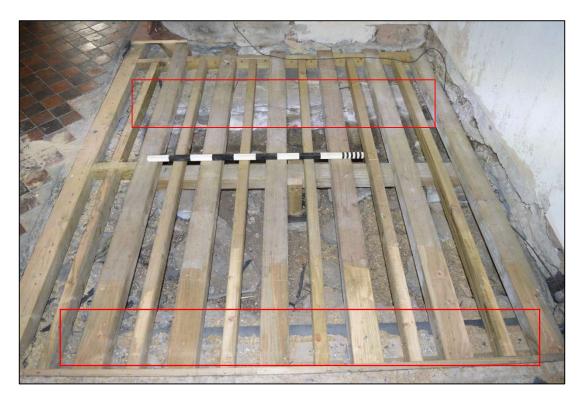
Sleeper walls (highlighted in red) aligned east/west in the south-west part of the nave, beneath modern timber joists. Taken from the north (Photo: Heneb PD24-029_004)
